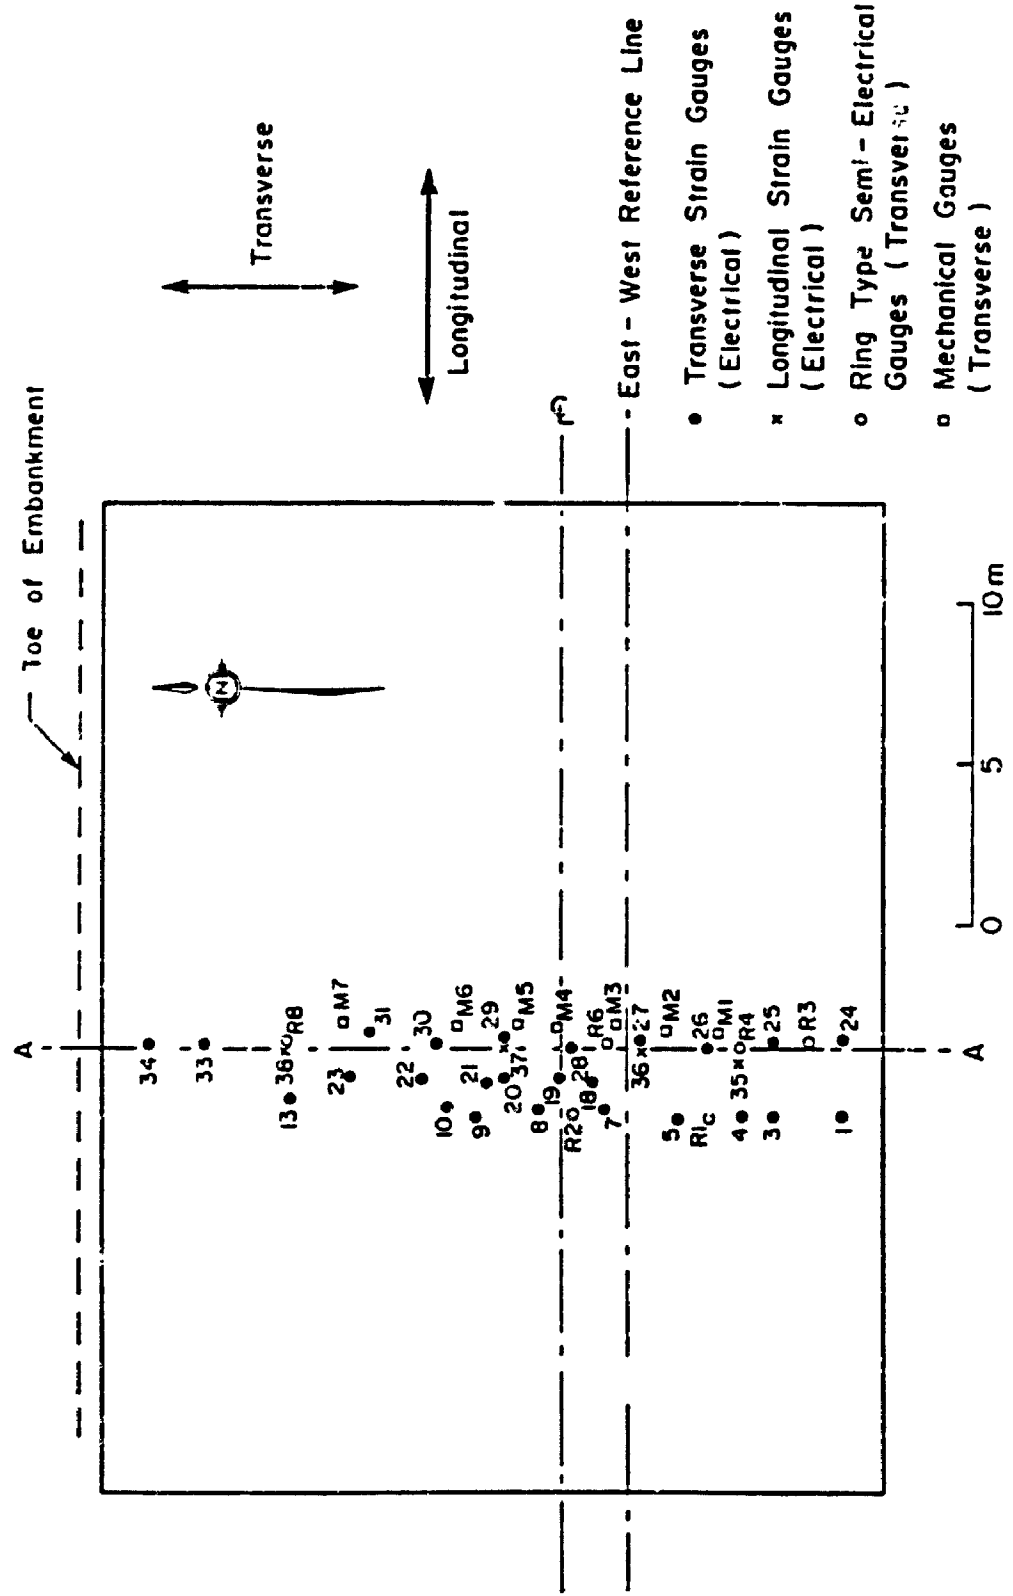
PLAN OF GEOTEXTILE REINFORCEMENT AND LAYOUT OF STRAIN GAUGES
